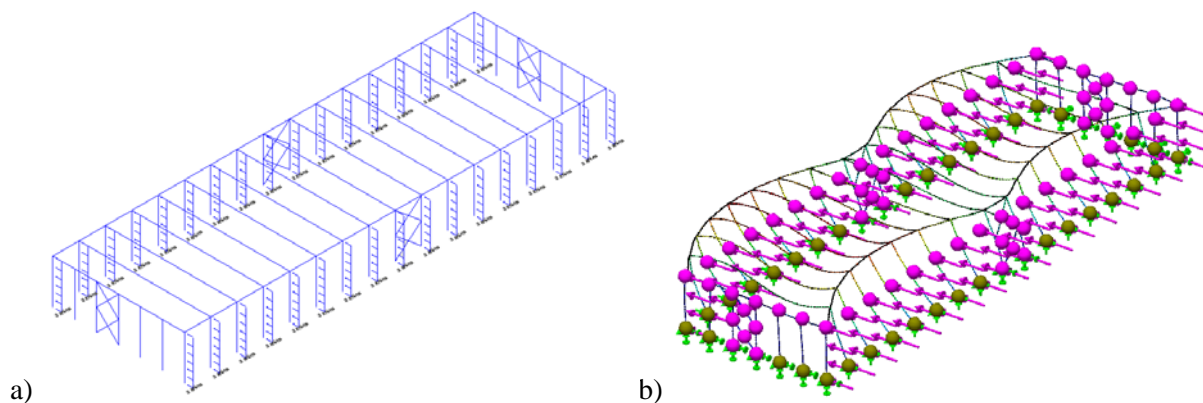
Open plan building with a shallow roof: a) simplified calculation the scheme and b) beam FE model: increased in scale deformations due to side wind load.
